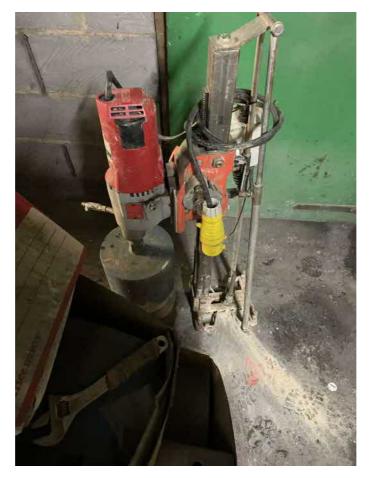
Example of concrete coring rig set up used to drill through concrete slab flooring in workshops
